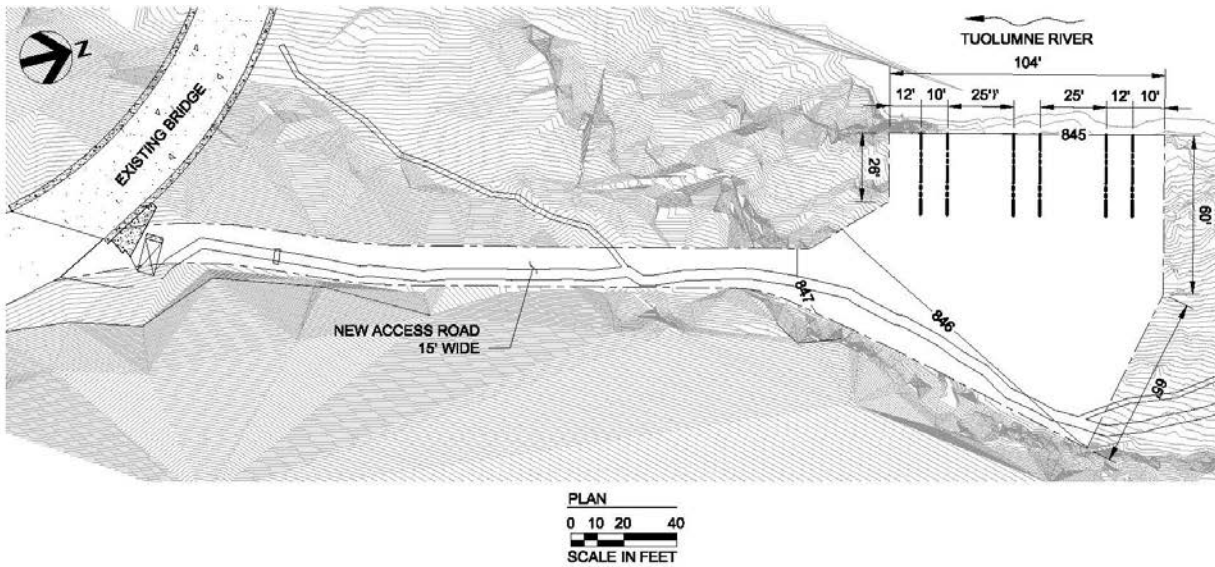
Proposed access road from Ward's Ferry Bridge to take-out deck.
